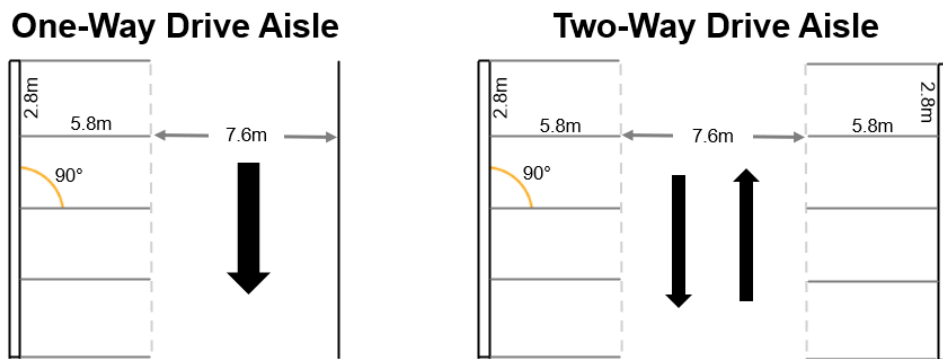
90-degree parking stalls and drive aisle dimension requirements
